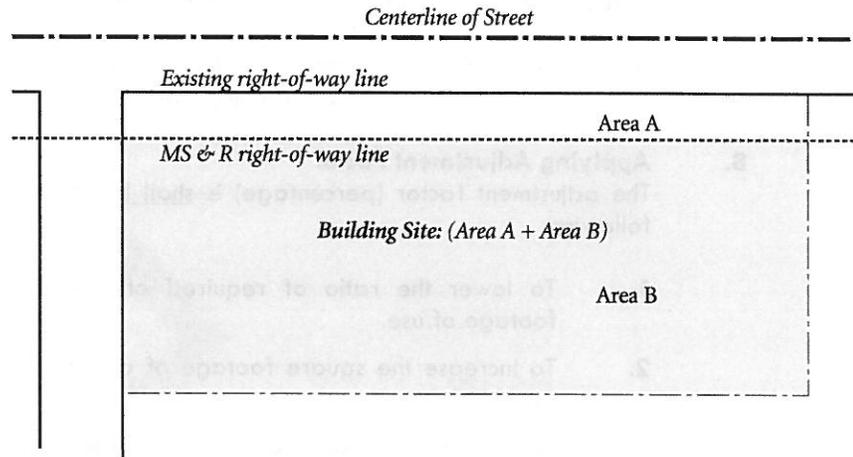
C: Adjustment of Off-street Parking Requirements
